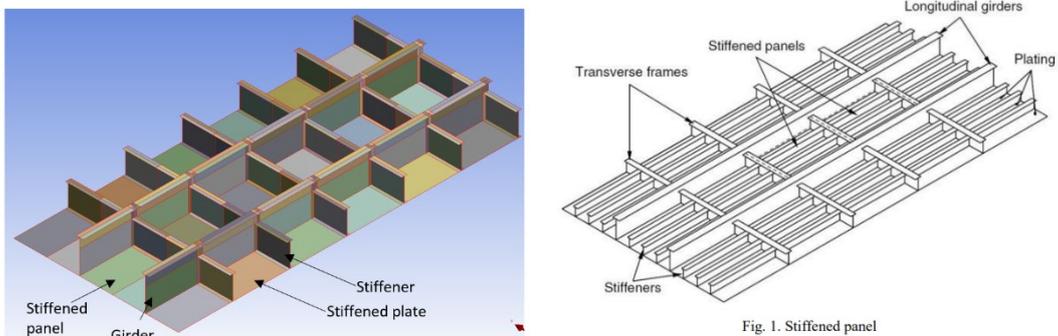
Isometric view of stiffened panel and stiffened plate; Stiffened panel (Yu et al., 2018)
